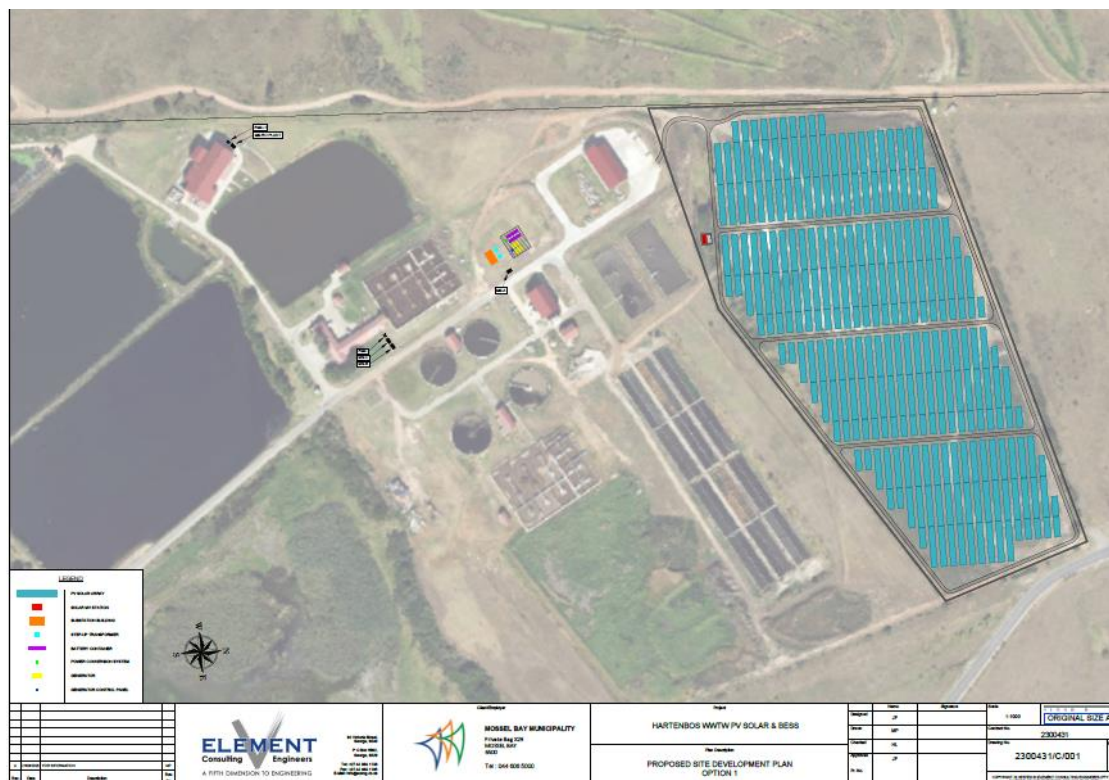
Proposed Site Development Plan - Layout Option 1 (Source: SES)
